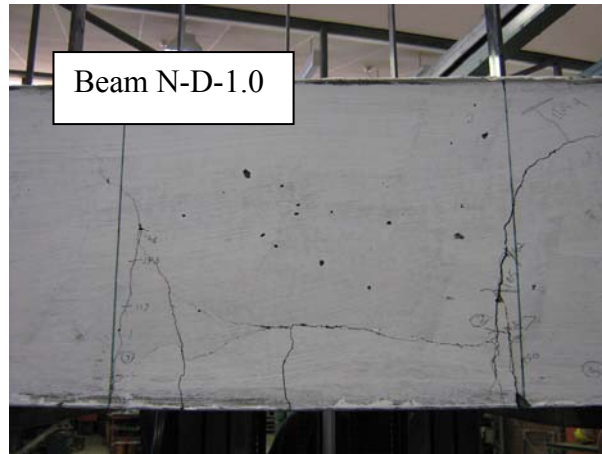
Crack Pattern of Normal Strength Geopolymer Concrete Beams over the Splice Region After Failure (D-Series)
